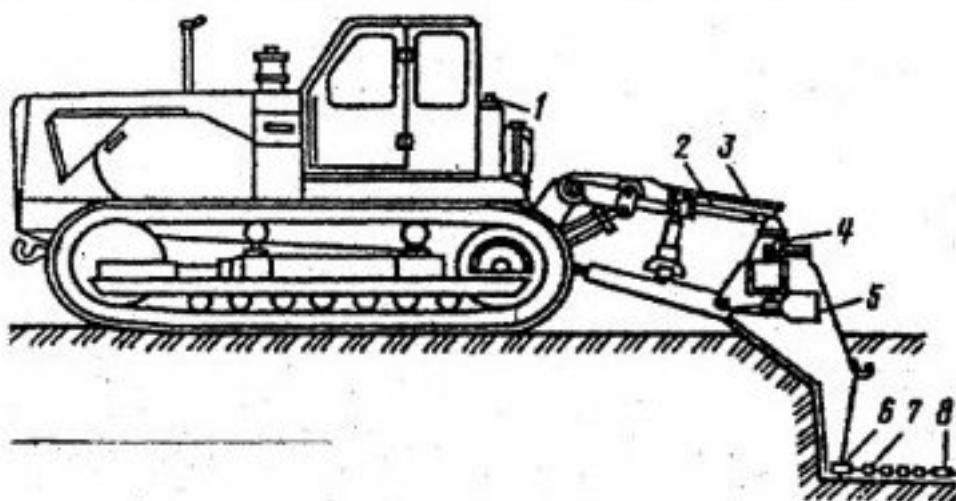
The design of a mole plow: (1) tractor, (2) hydraulic cylinder controlling the rotation of the working tool, (3) depth indicator, (4) frame, (5) blade, (6) steering cone-shaped mole, (7) chain, and (8) widening mole
